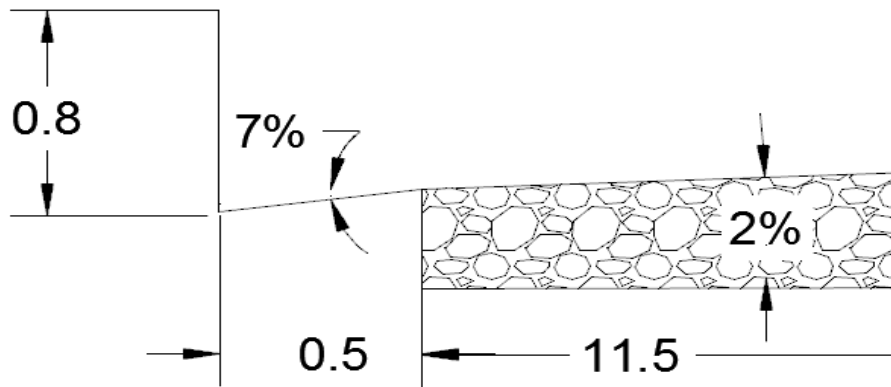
Typical cross section of roadway to the crown of the road with curb and gutter and dimensions in feet.
